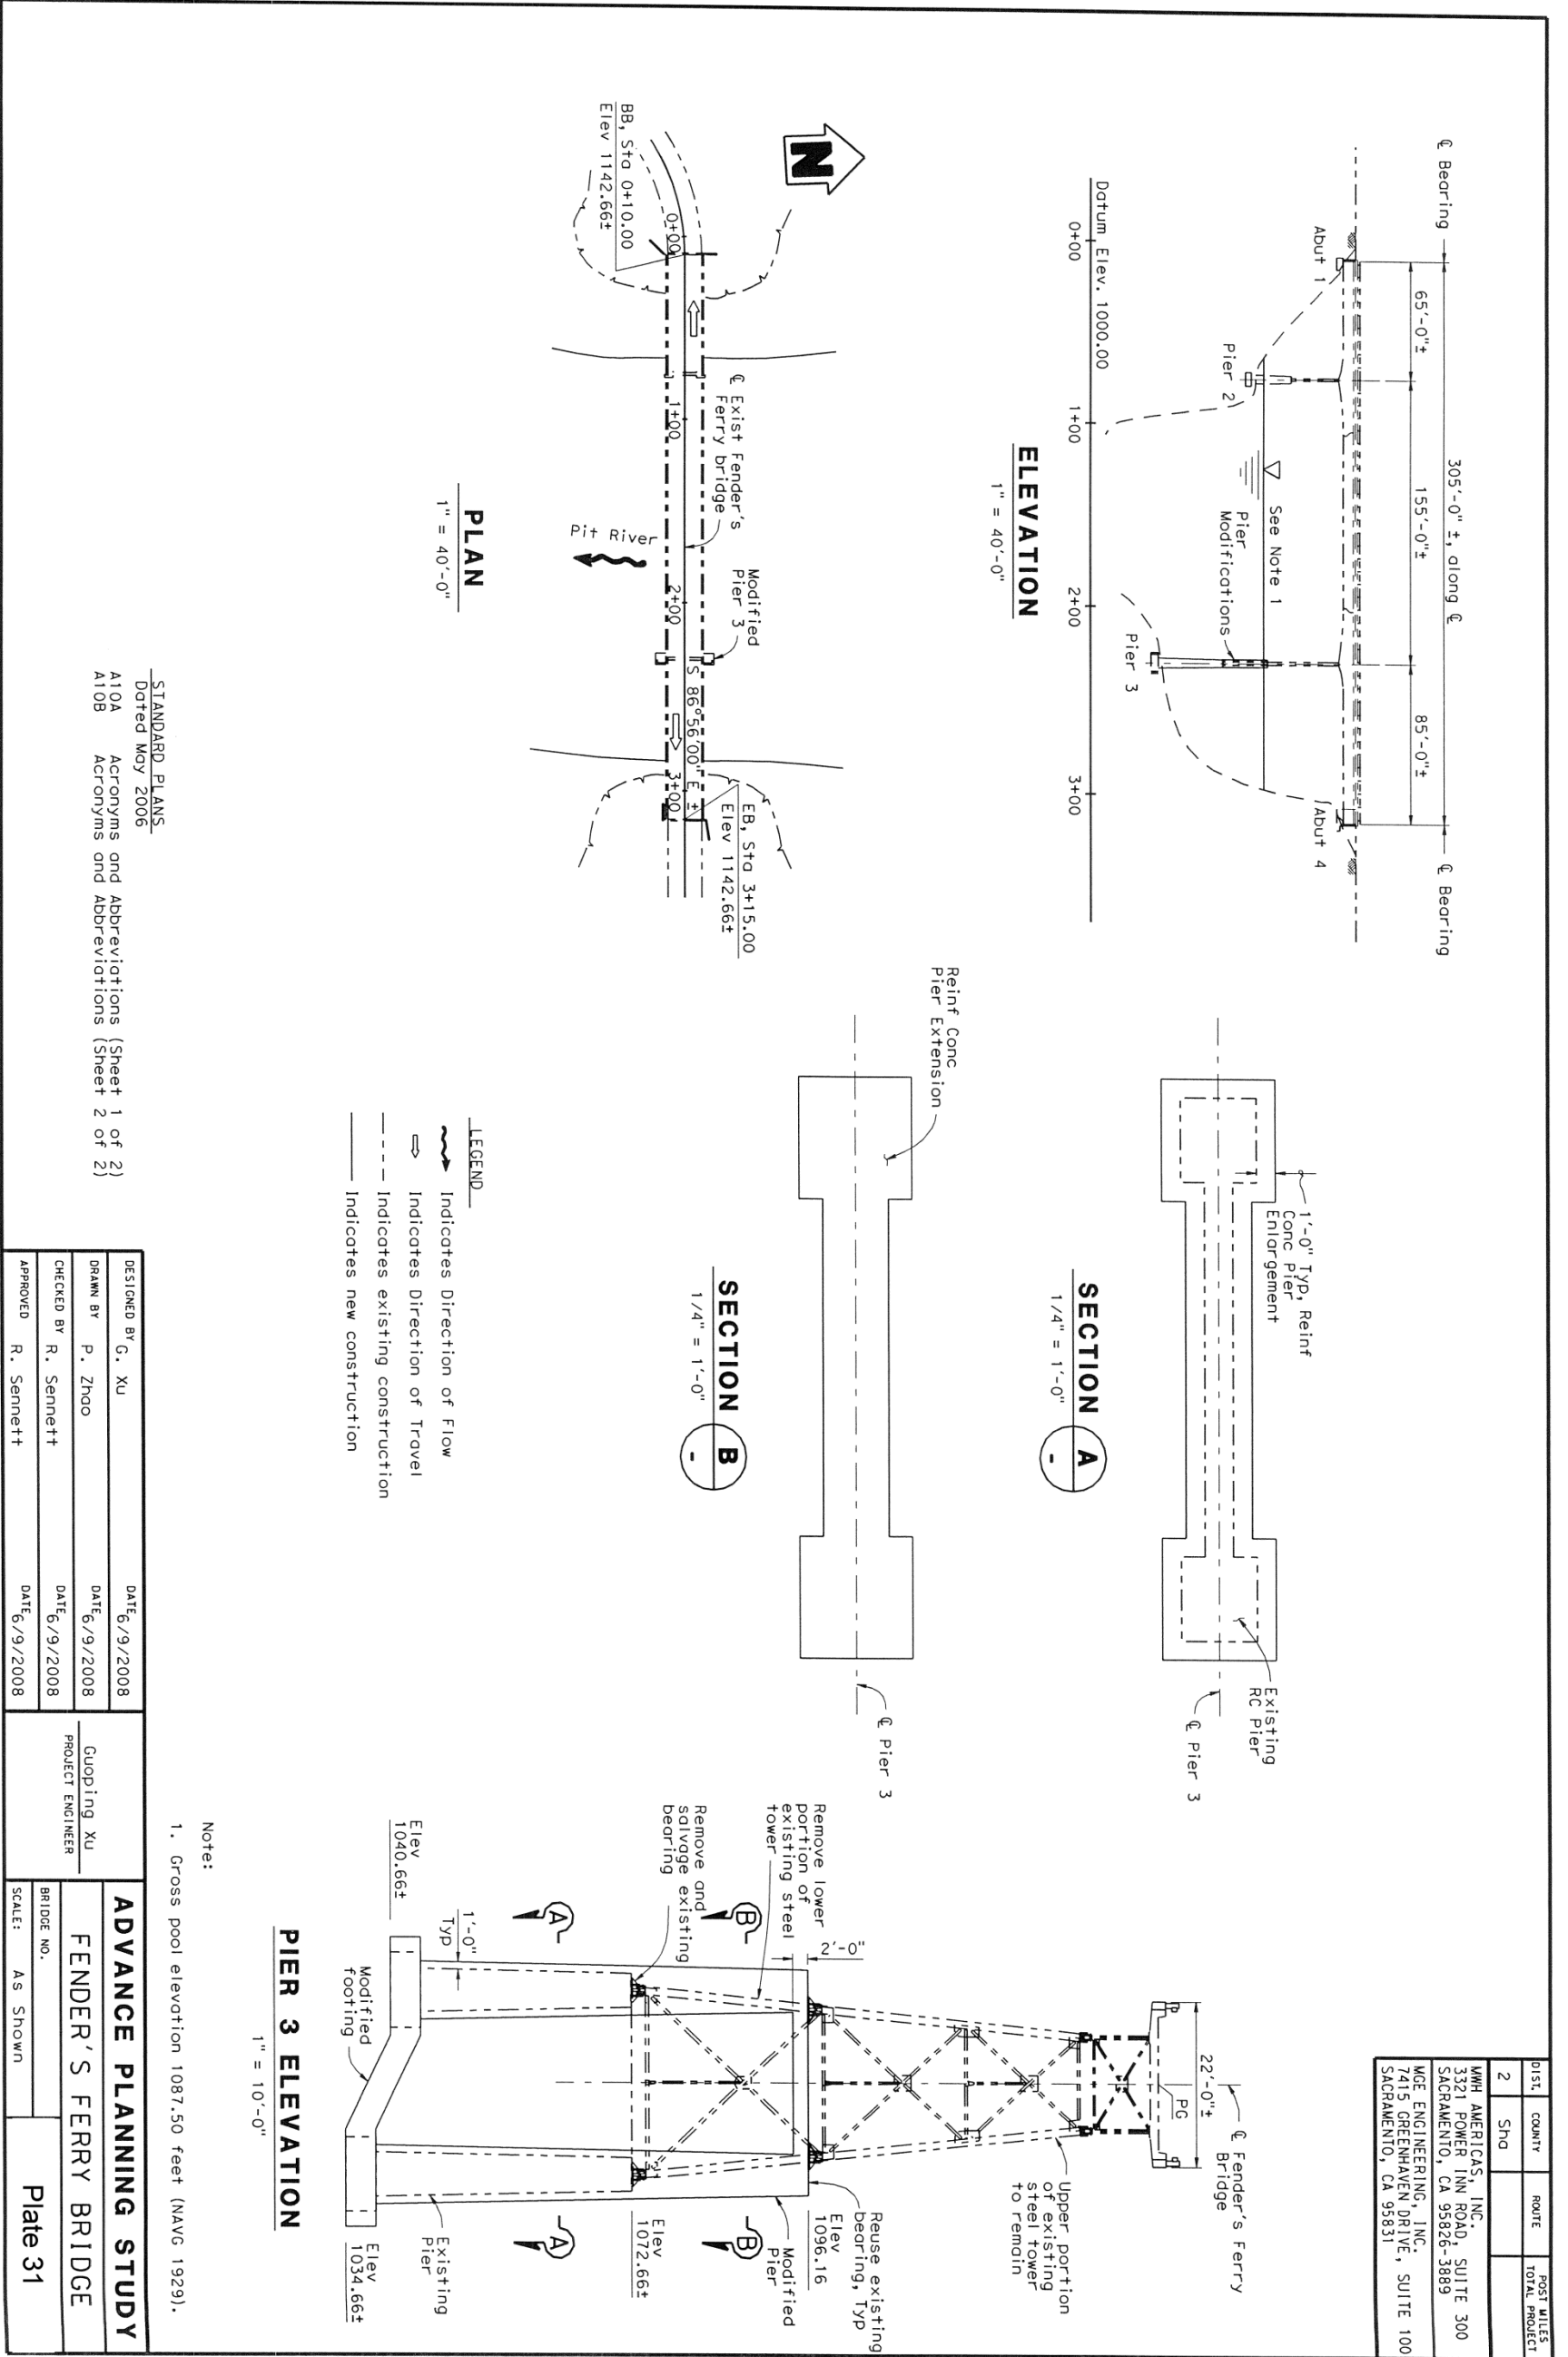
Fender's Ferry Bridge – Elevation, Plan, and Section
